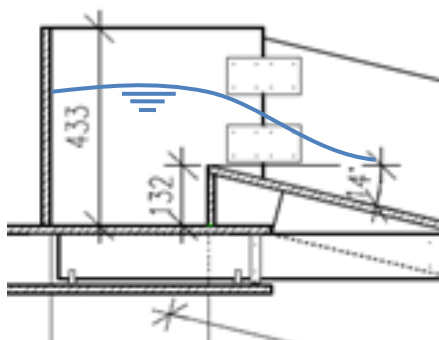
Detail of crest of the hydraulic model at the intake section (dimension defined in mm).
